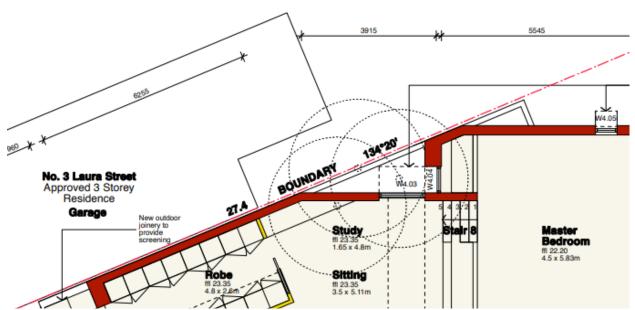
Extract from DA198/2010 showing approved roof top area with window (no door access to roof top and no balustrade)
